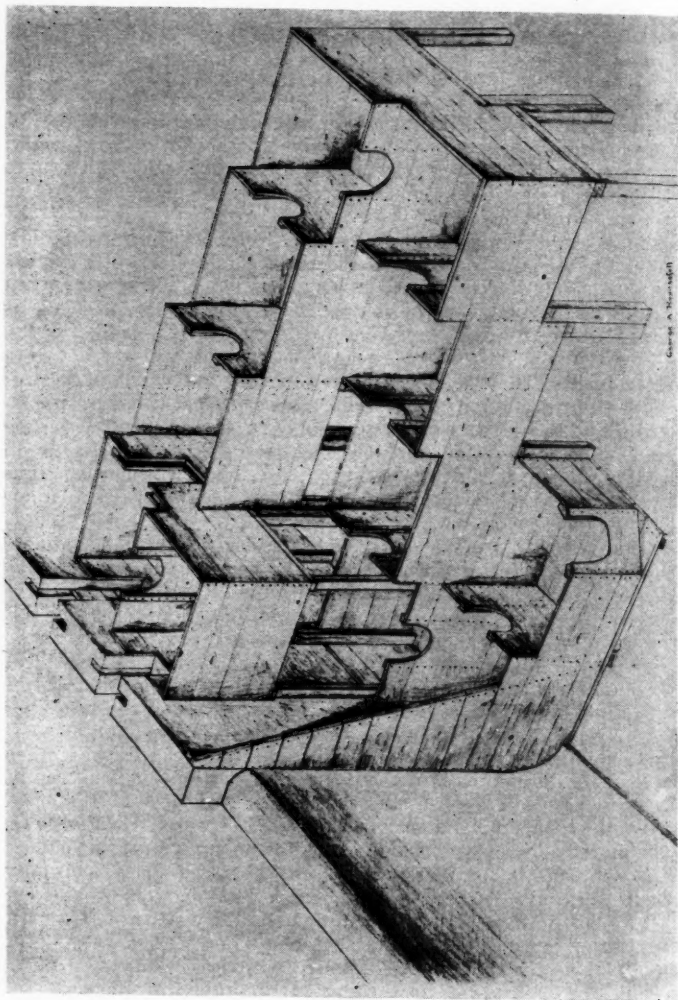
Sketch of a pool-type fishway designed to pass alewives over a 12-foot dam.
